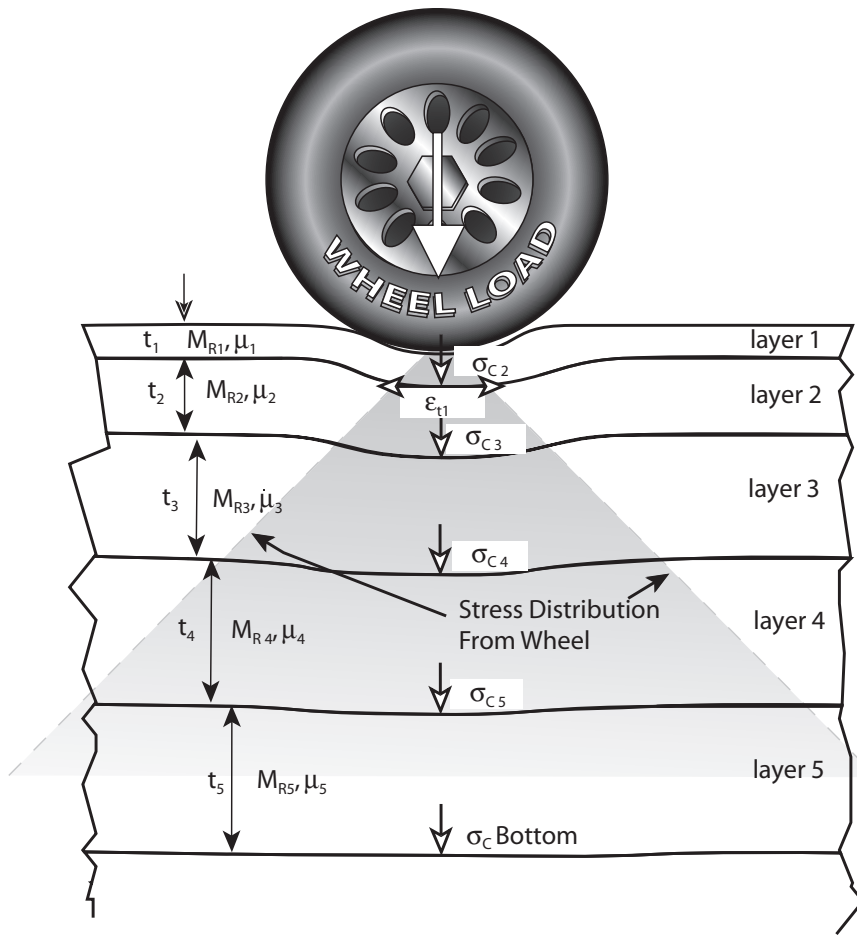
Elastic Pavement Layers Undergoing Simple Loading
